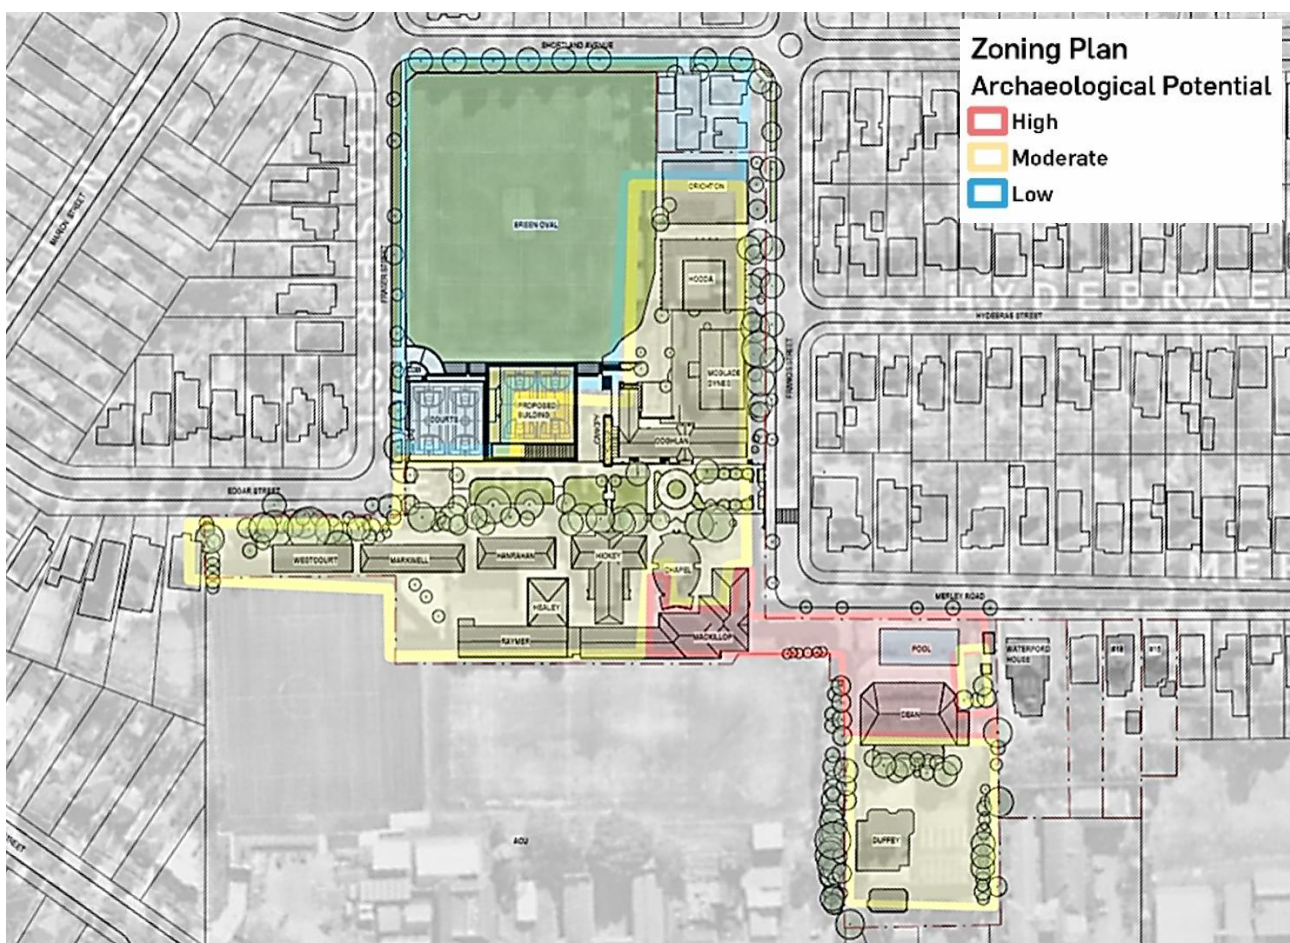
Overlay of proposed site plan on areas of archaeological potential. The proposed works are indicated in the middle as 'Proposed Building and located within an area of Low to Moderate potential.
